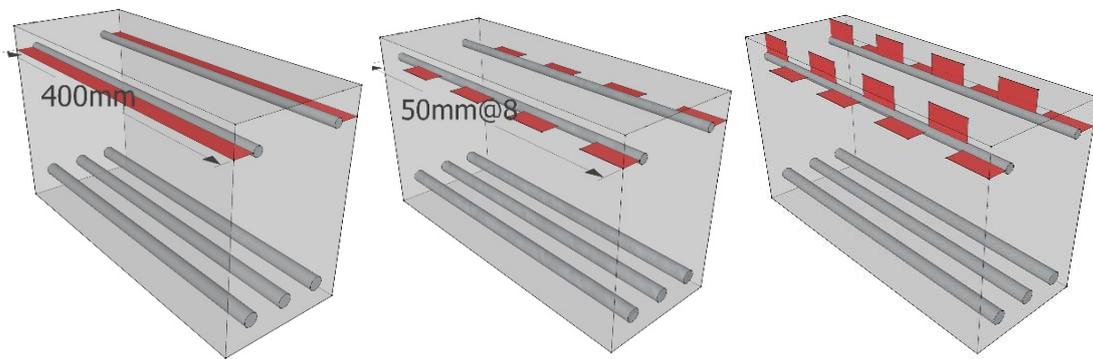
Crack of cover concrete by slits (left : B-Sc center : B-Si right : B-US)
